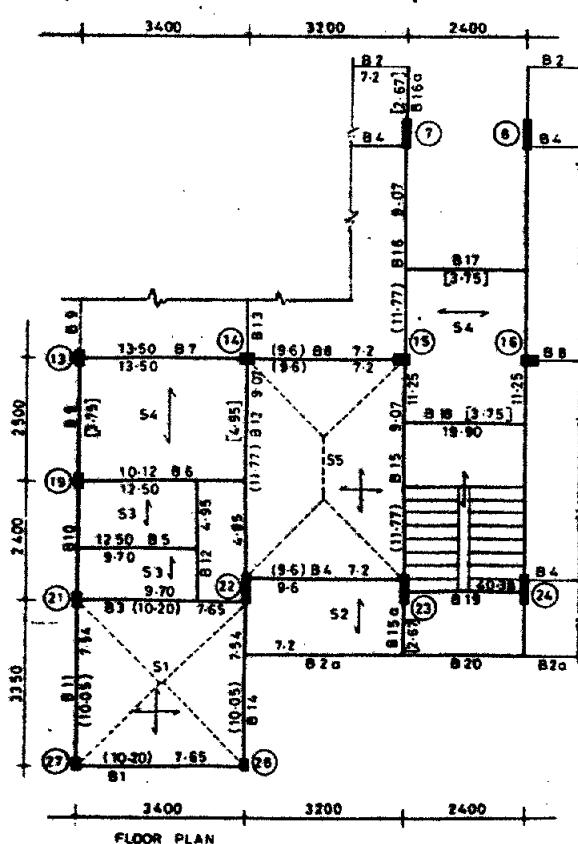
Plan Showing Floor Slab End Shears Transferred to Beams.
